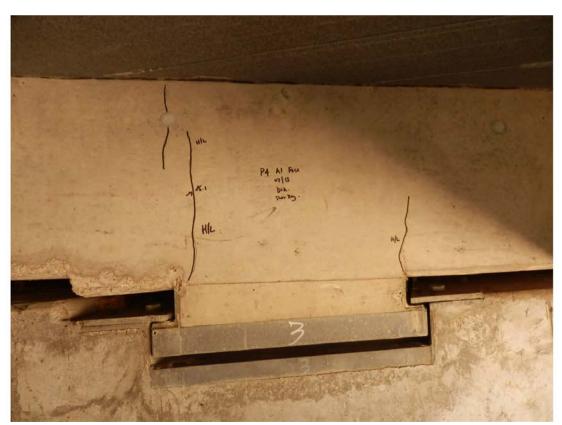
Pier 4 abutment 1 face. Hairline cracking from internal corners of shear key up to plastic bolt hole forme for the formwork during construction. (Taken: 31-Jul-2013)
